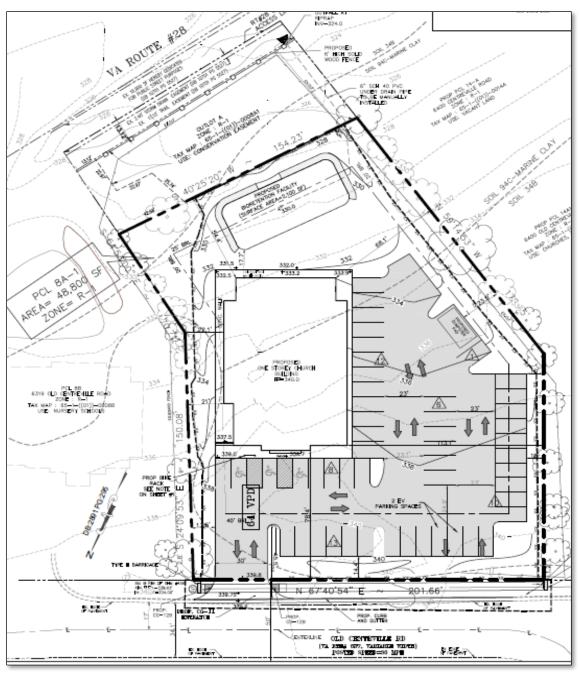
Excerpt of the special permit plat depicting the proposed parking area Source: Applicant
